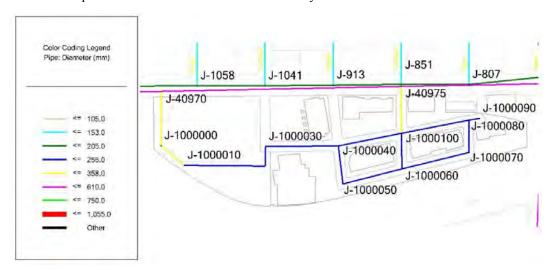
WaterCAD Network - Large Footprint Building Site Layout
